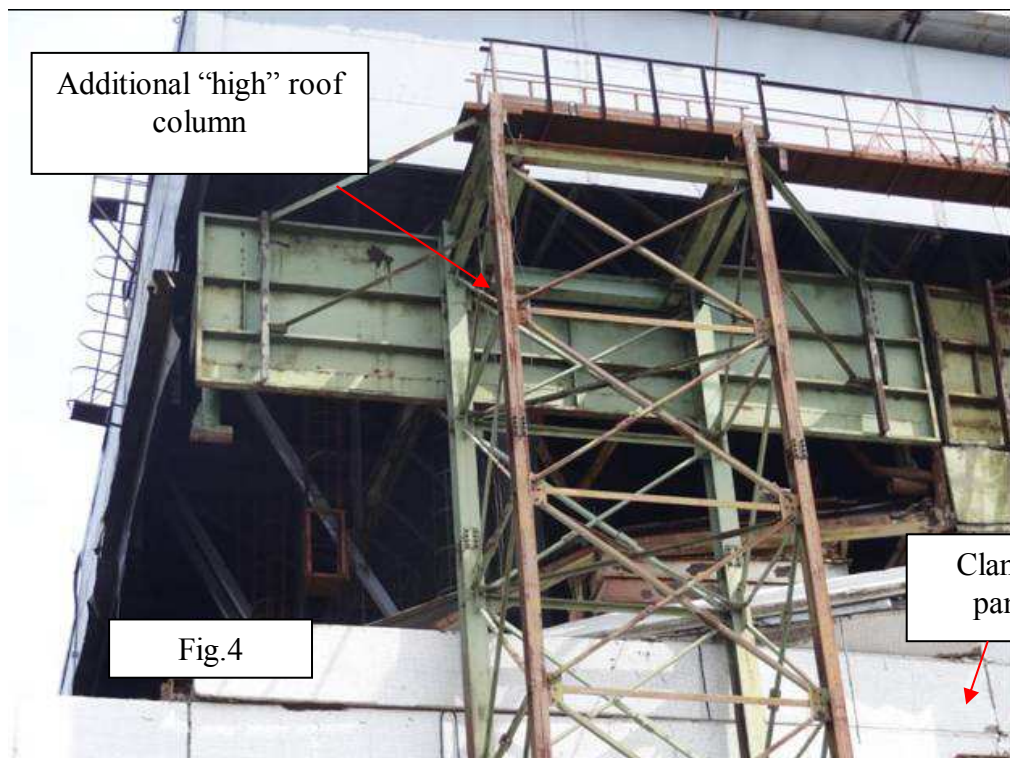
Turbine Building view from outside of wall panel failure in "high" roof zone next to gridline 50
